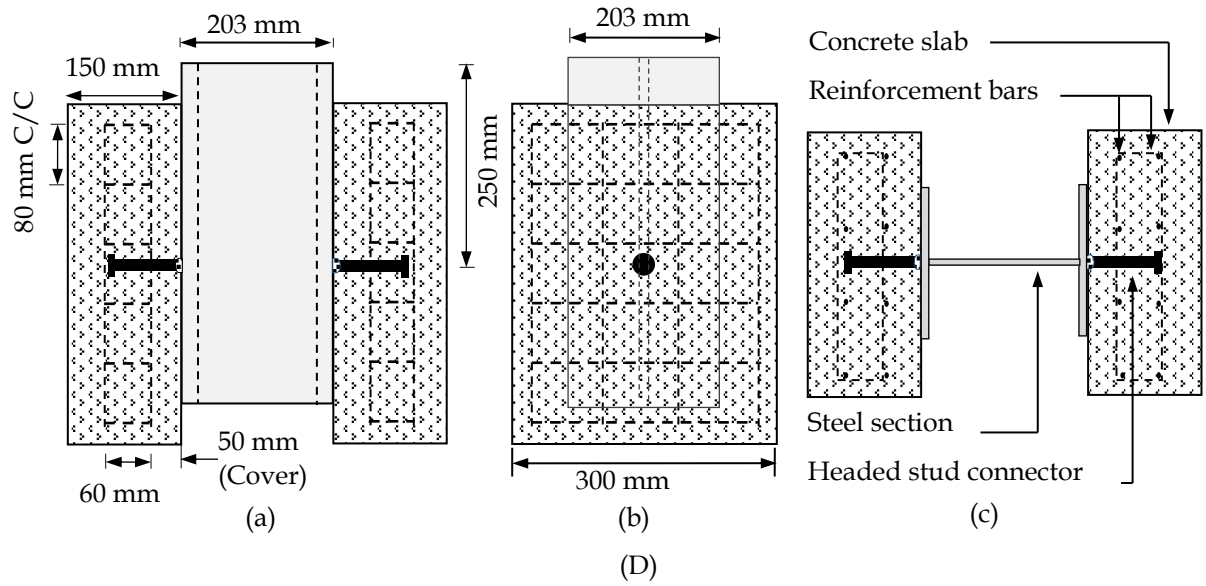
(D): Steel-concrete composite specimen with 60 mm double reinforcement layer cage at 50 mm from root of stud; (a) front view, (b) side view and (c) top view
